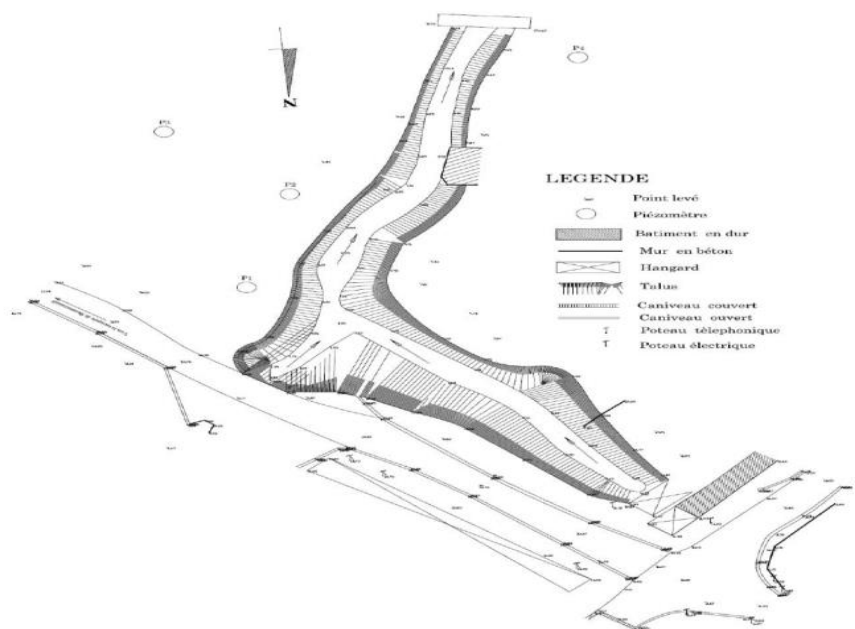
Plan view of the Kotto Ravine and its surroundings (scale: 1:25000) [25]
